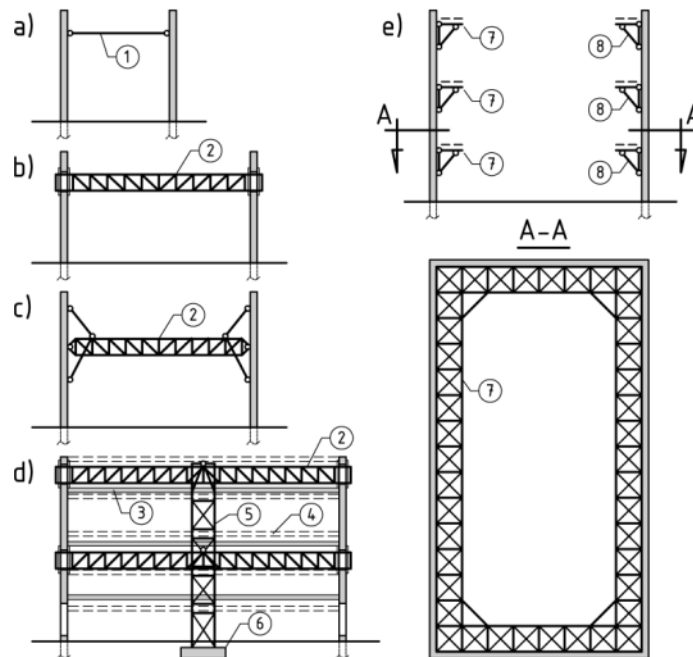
Examples of design solutions of renovation bracings of strut type: 1 - strut bar, 2 - 4 - chord spatial truss, 3 - ceiling for demolition, 4 - designed ceiling, 5 - steel truss column, 6 - the temporary foundation, 7 - bracing frame, 8 - angle strut
